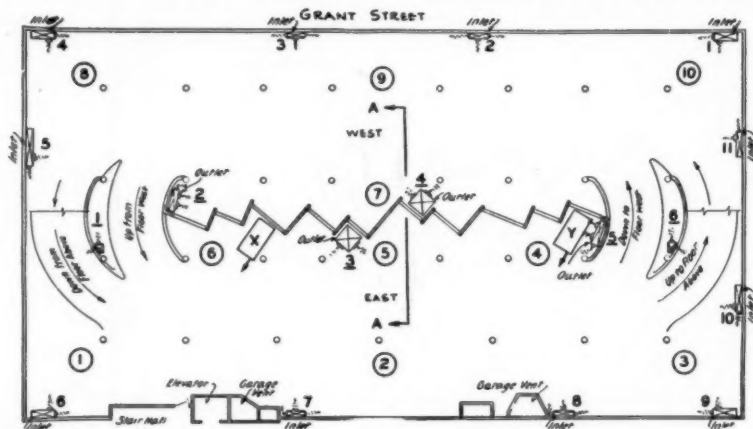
TYPICAL FLOOR—GRANT BUILDING GARAGE
